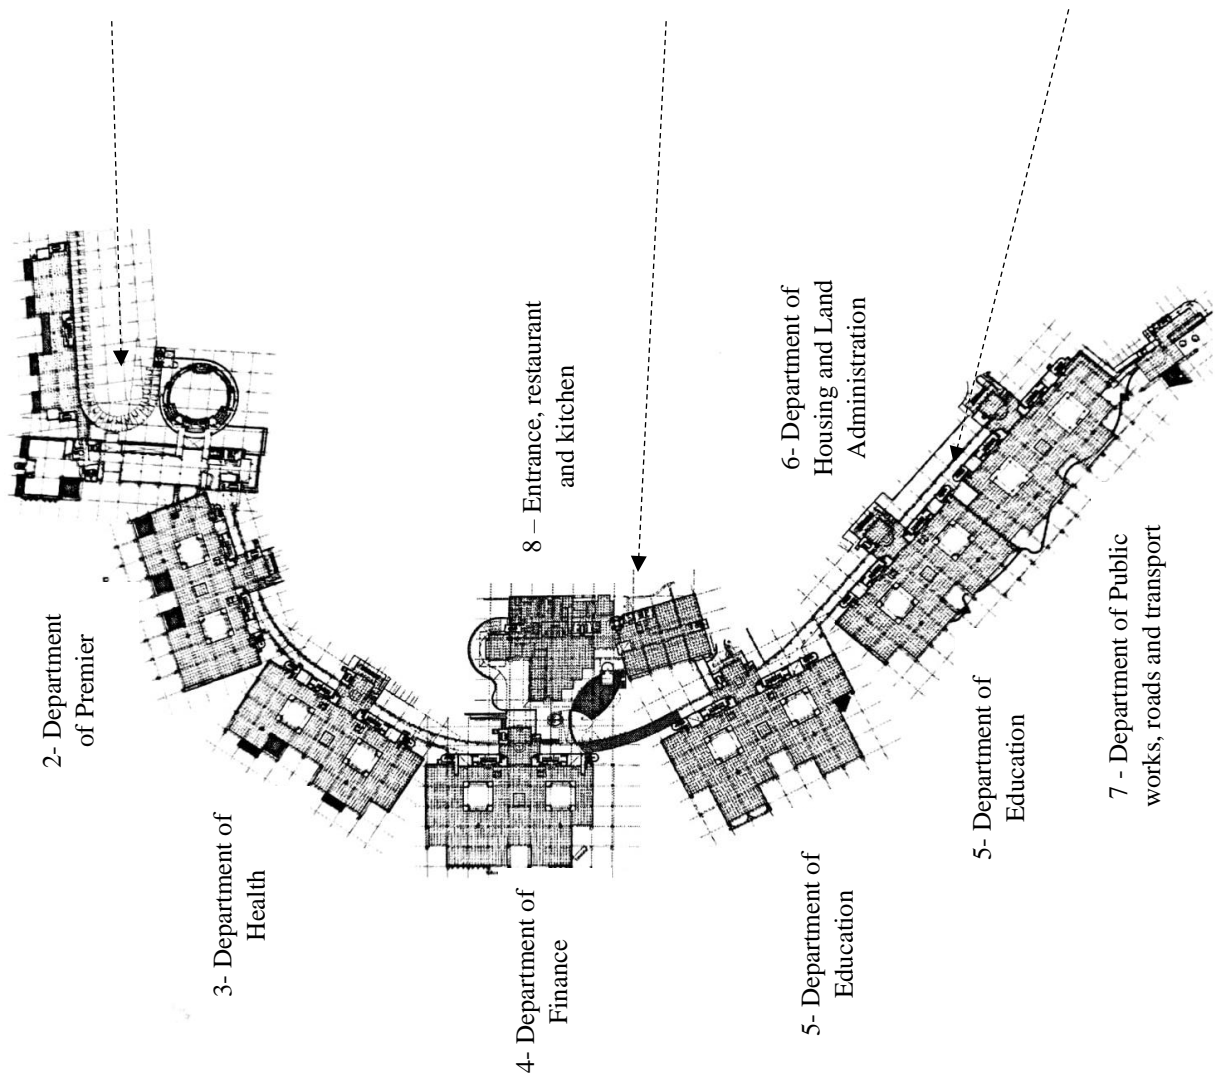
4: Upper ground floor plan (Source: Noble, 2011: 28) (Courtesy of: MPTS)
